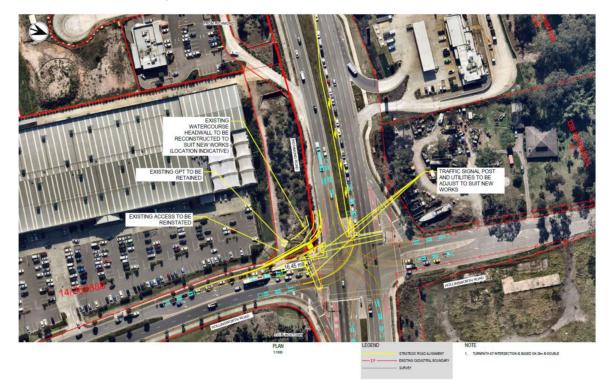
Intersection Upgrade Concept Plan (Source: Arup)
